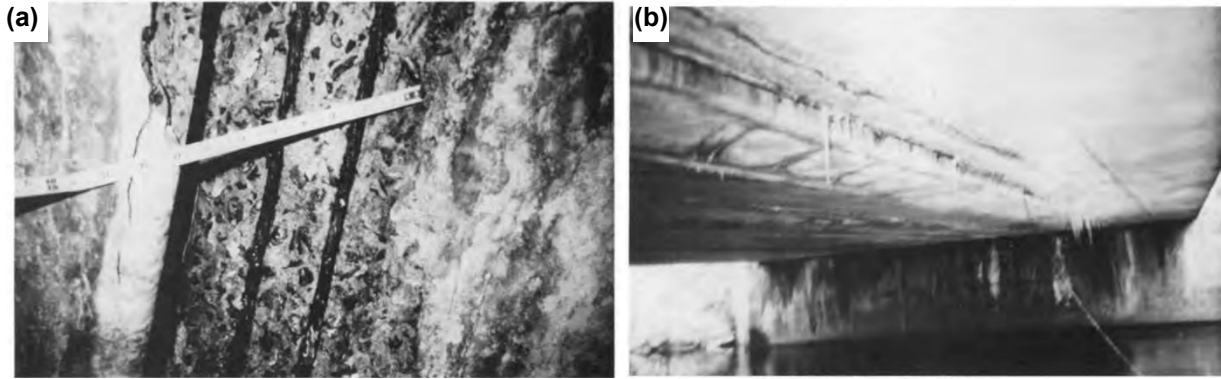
8: The deterioration on the Walnut Street Bridge (a) Spalling of concrete cover (b) Ruptured prestressing strands hanging under the bridge into river (Shenoy and Frantz, 1991).
